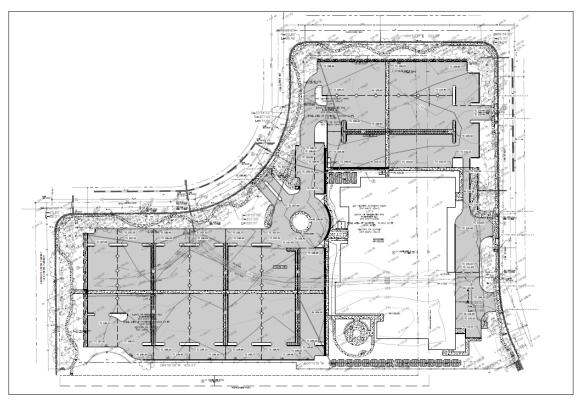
Site Access and Circulation. Source: Attachment 4: Project Plan Set
